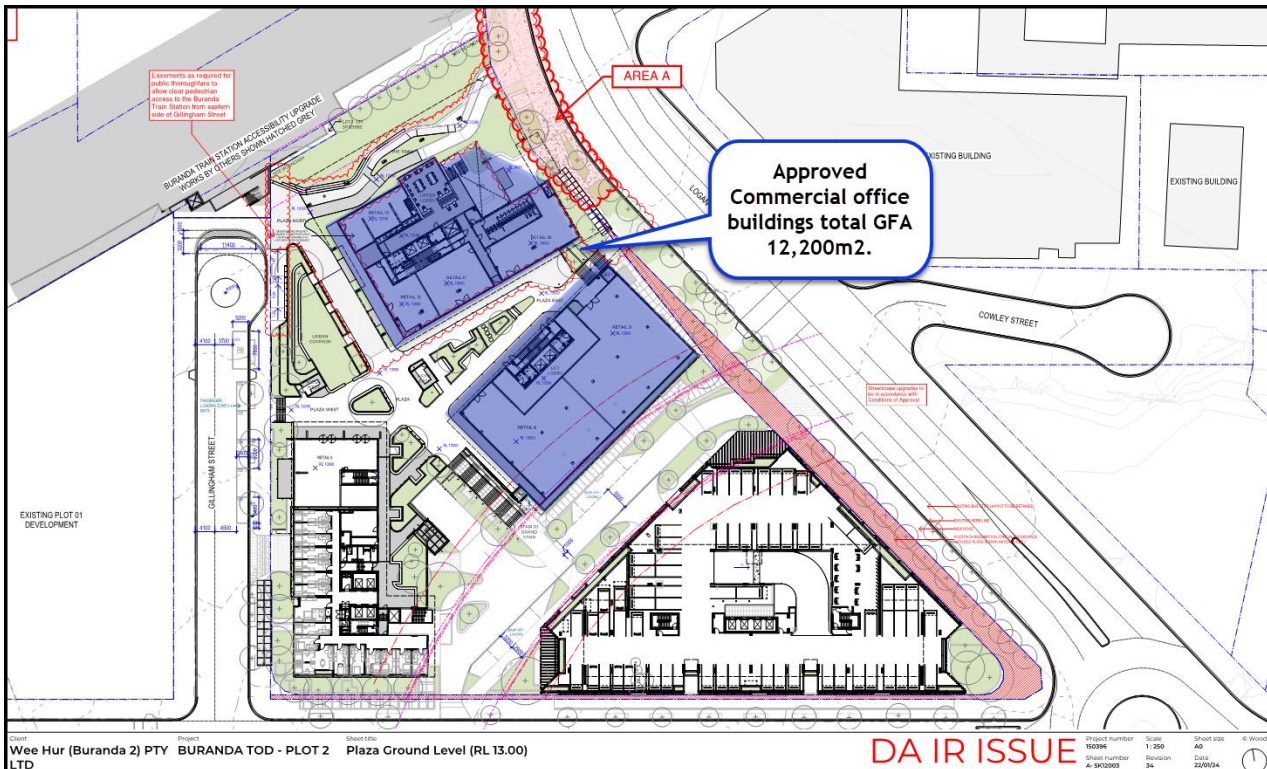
Approved Site Plan Buranda TOD Stage 2 – Eastern Precinct
